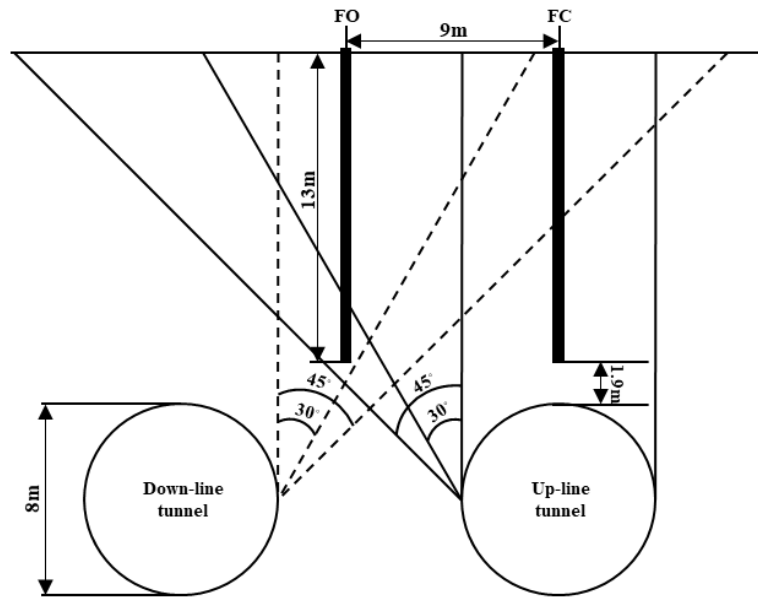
A cross section showing tunnels and the adjacent piles (Selemetas and Standing, 2017)
